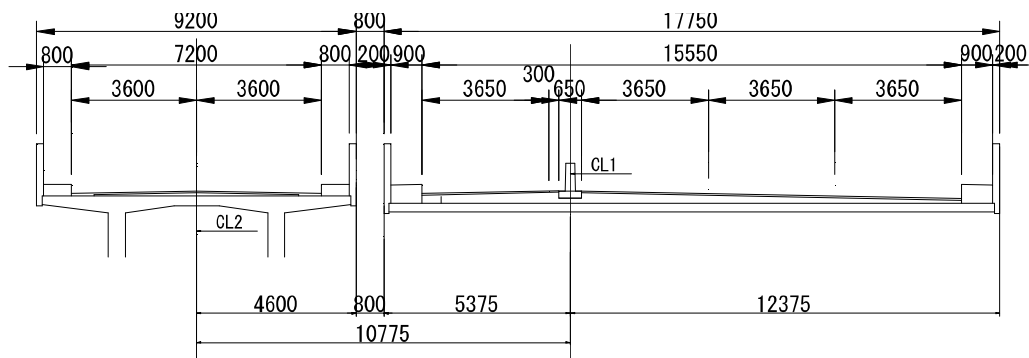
Typical Sections of New and Existing Gumti Bridge
